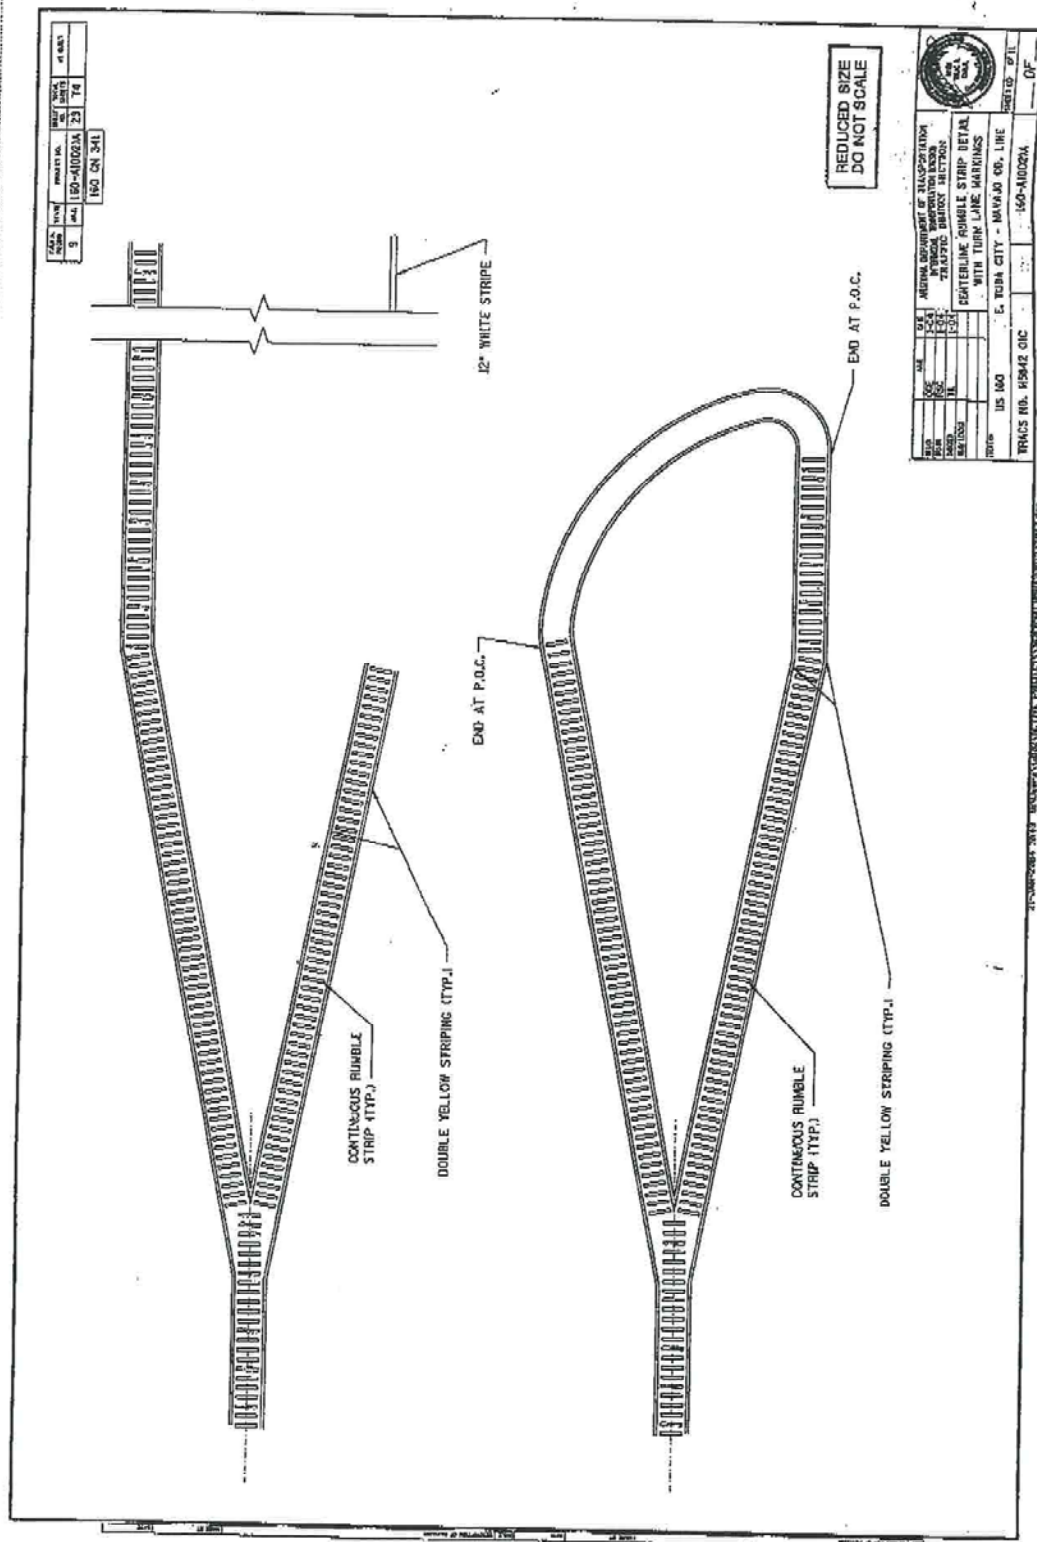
Arizona Centreline Rumble Strip Detail with Turn Lane Markings
